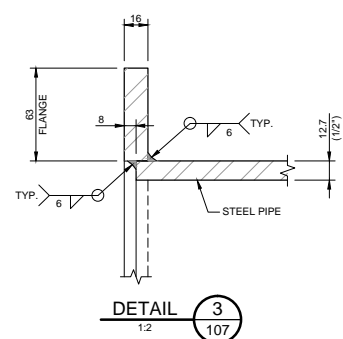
DETAIL - LATERAL PIPE FOR FILLING CULVERT
